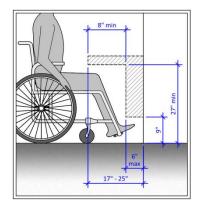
Illustration showing minimum dimensions of a service desk for a wheelchair user
